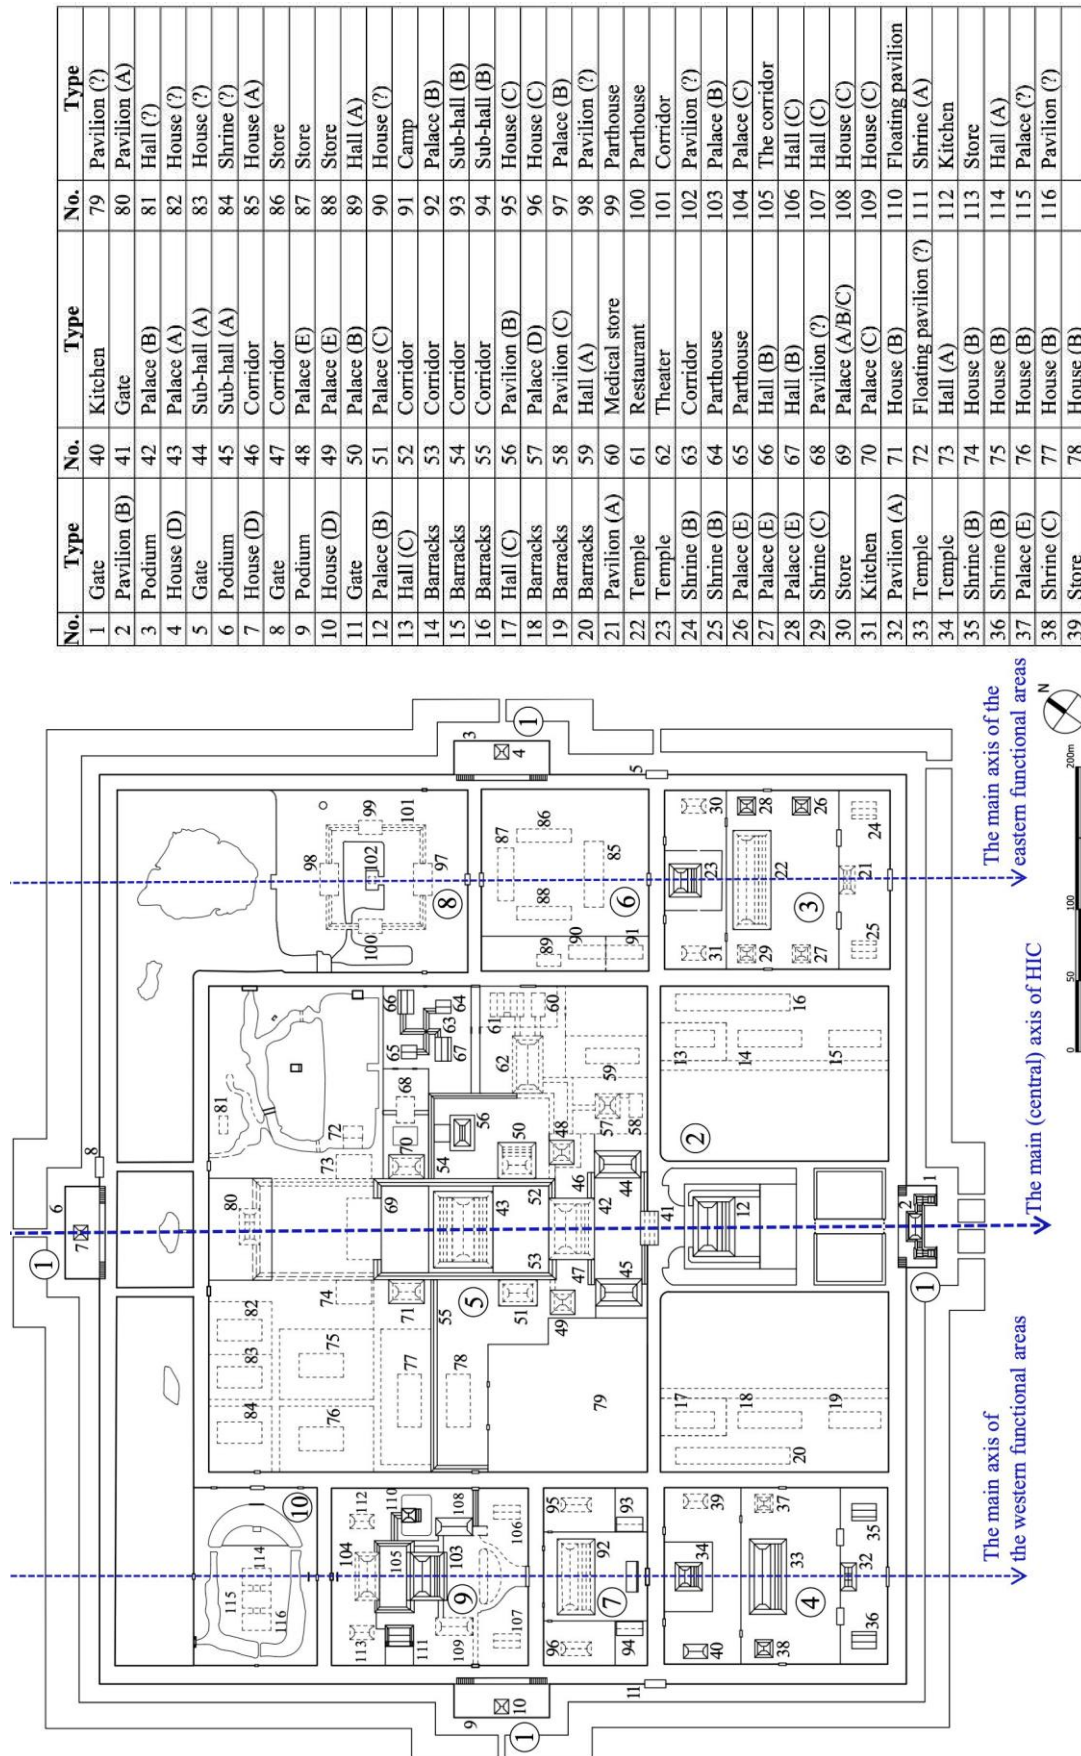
Name types and locations of buildings on the site plan of Hue Imperial City
